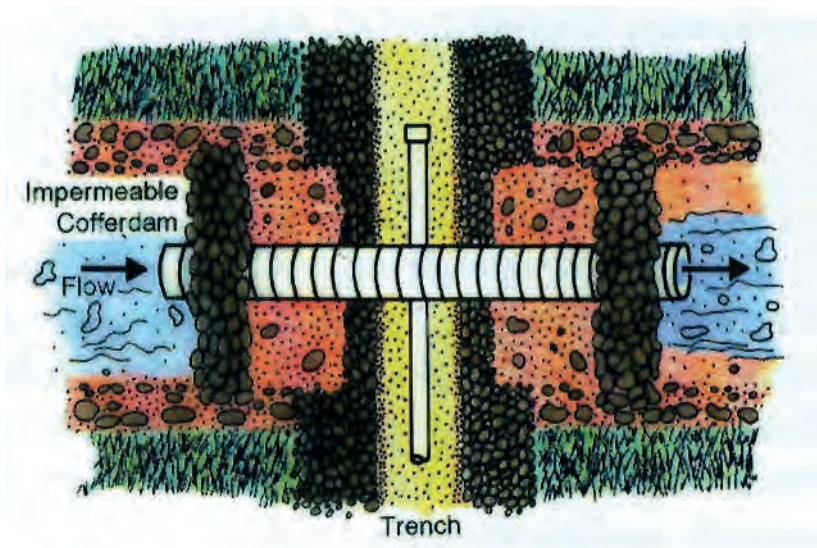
Stream crossing dewatered by means of an elevated pipe
